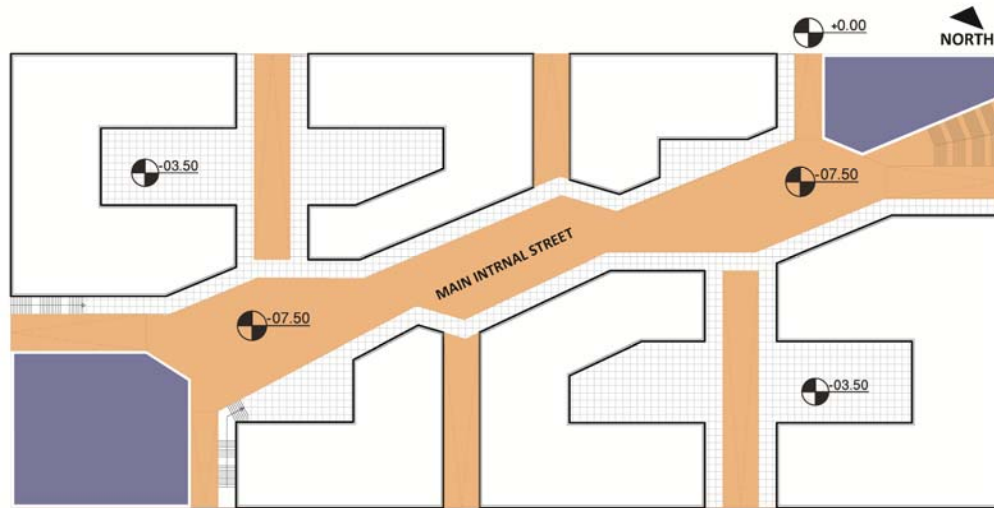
Floor plan of the proposed shadow umbrella - Showing the location of pools
